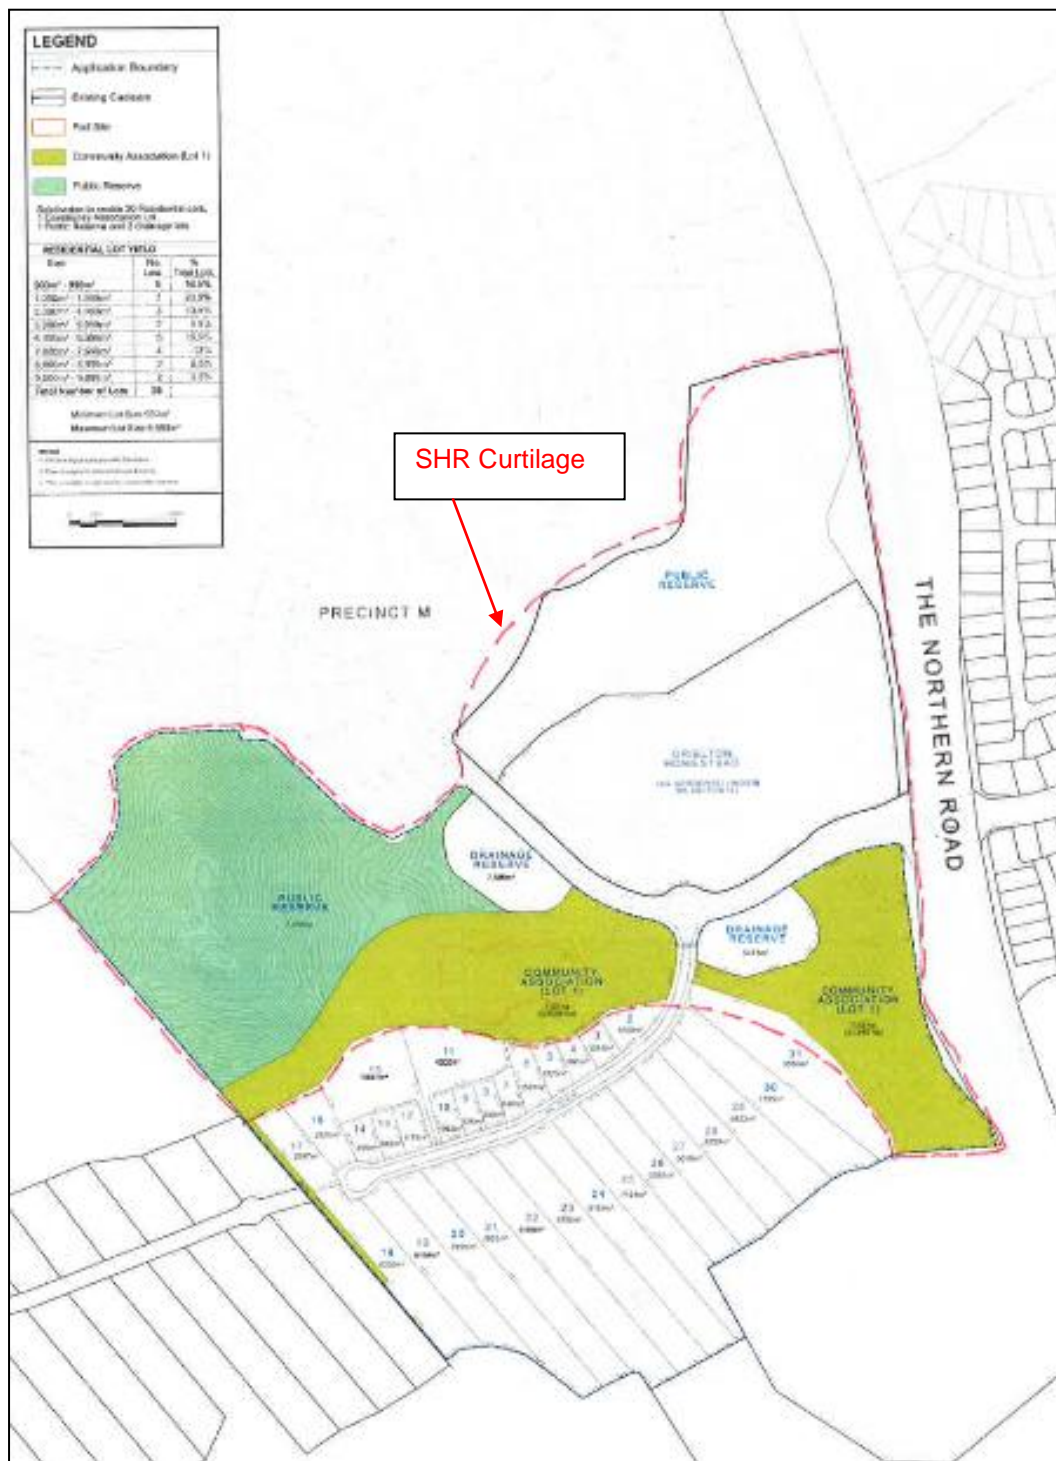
Subject Site – Equestrian Park & Residential Subdivision & superimposed SHR Curtilage
